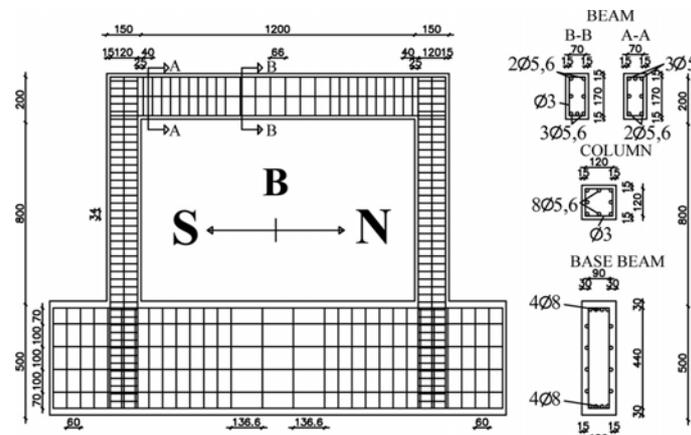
Reinforcement detailing of the RC frame models (mm)
